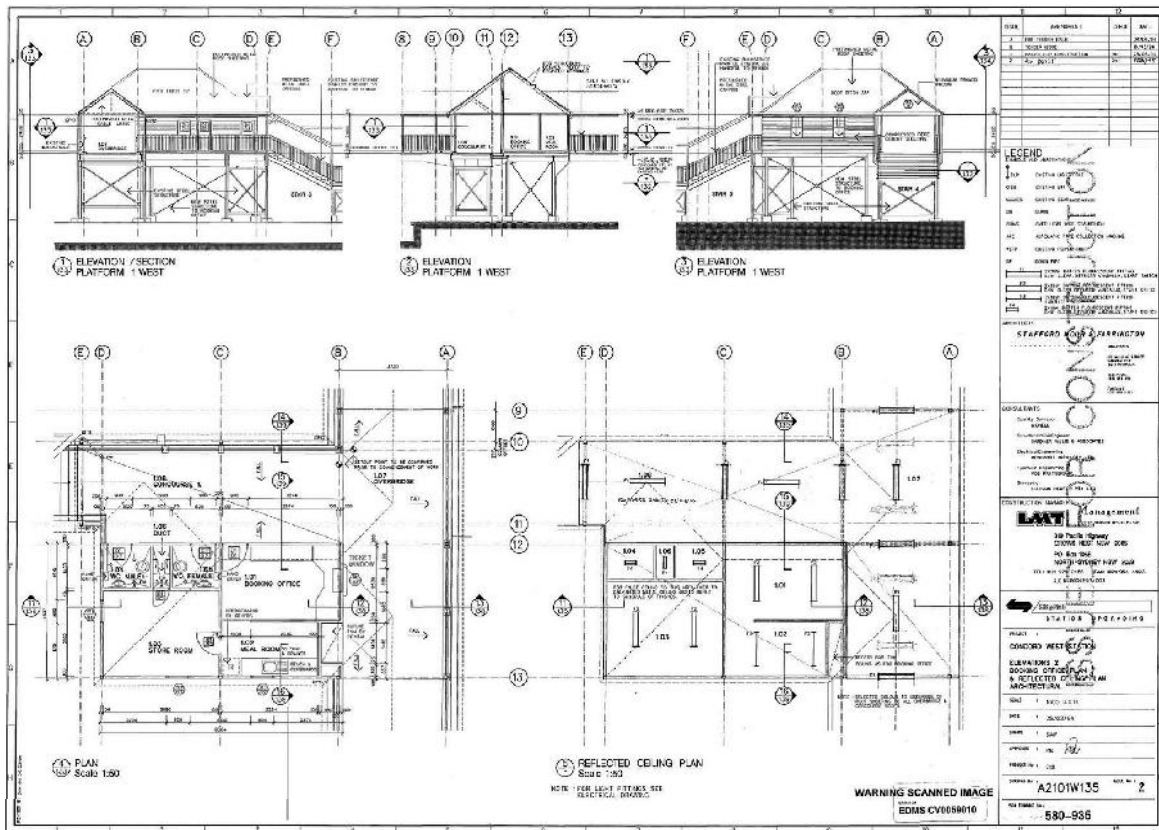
Plan of new overhead booking office, Concord West Station, 1994. (RailCorp Plan, Ref: 0059010)
